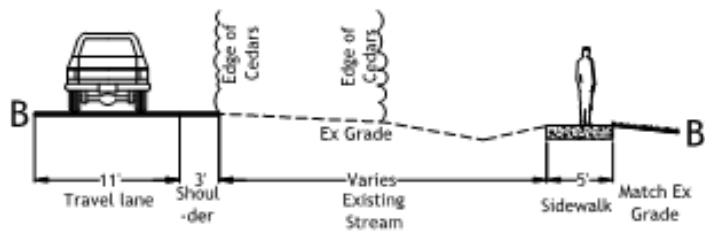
TYPICAL CROSS-SECTIONS – AREA 2
